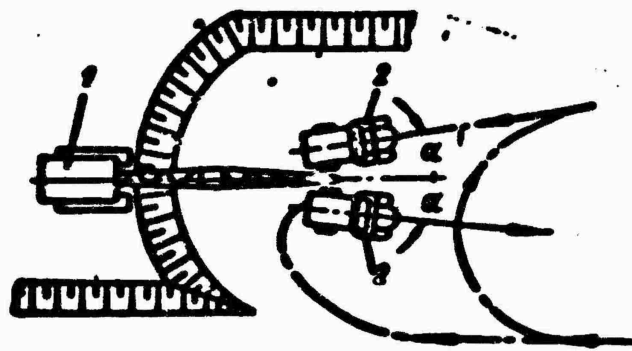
The shuttle method of soil loading: 1) Excavator (dragline); 2) dump trucks.
